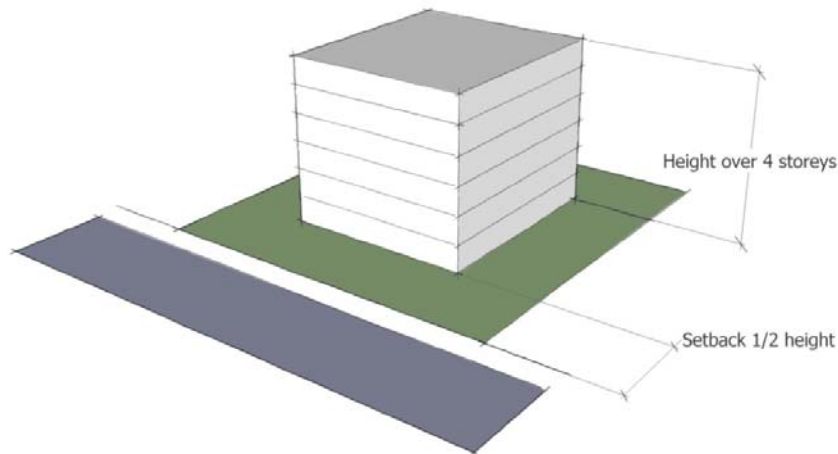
a – Setbacks for buildings greater than four storeys adjacent to a residential zone
